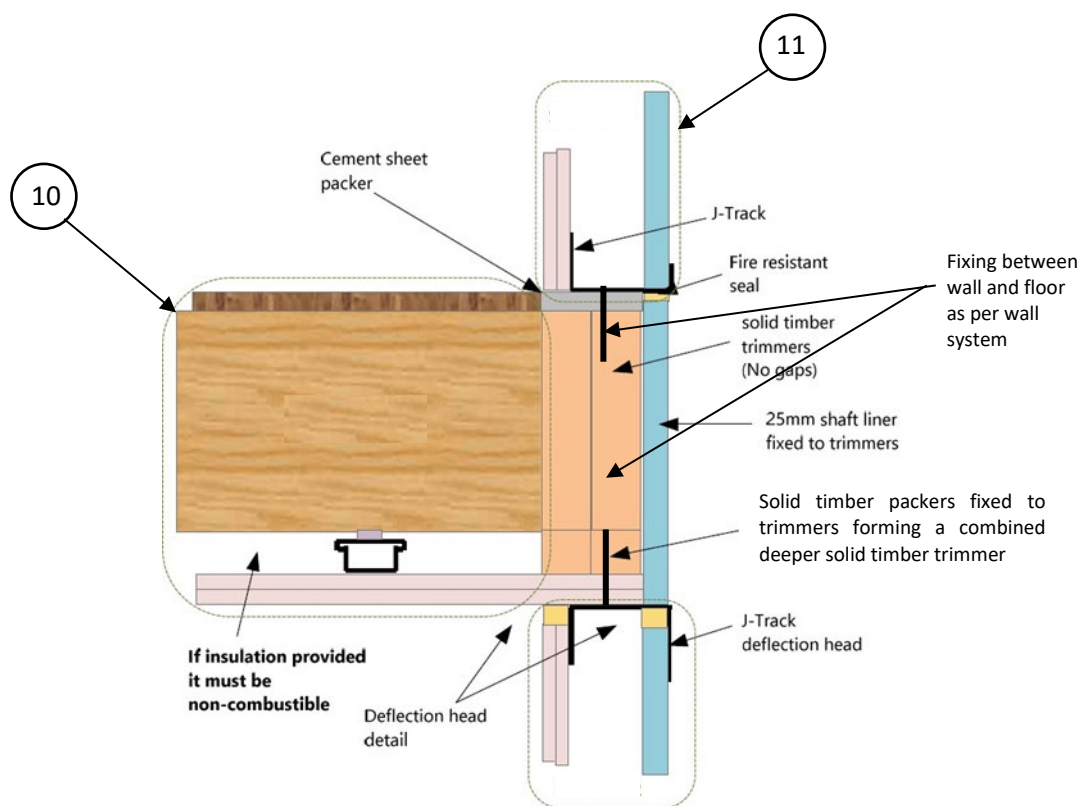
Steel stud shaft wall interface with timber floors maintaining shaft continuity – Section view
